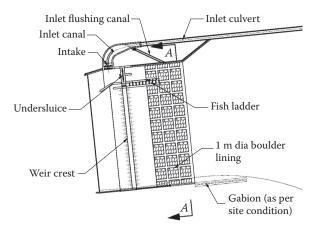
Plan of headworks with flood protection walls for Example 4.3.
